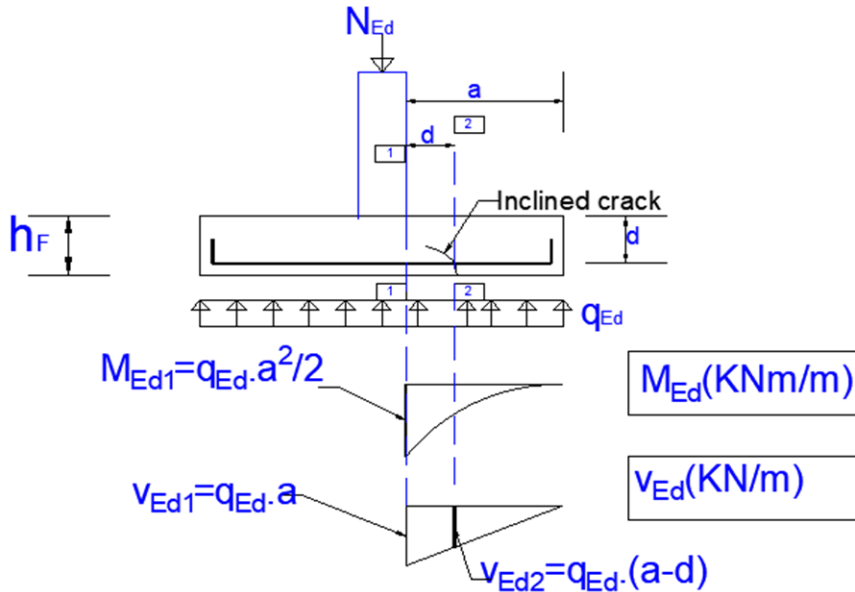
Reinforced foundation with design load effect (M_{Ed}) and V_{Ed} at two sections, at wall face and distance d from wall face
